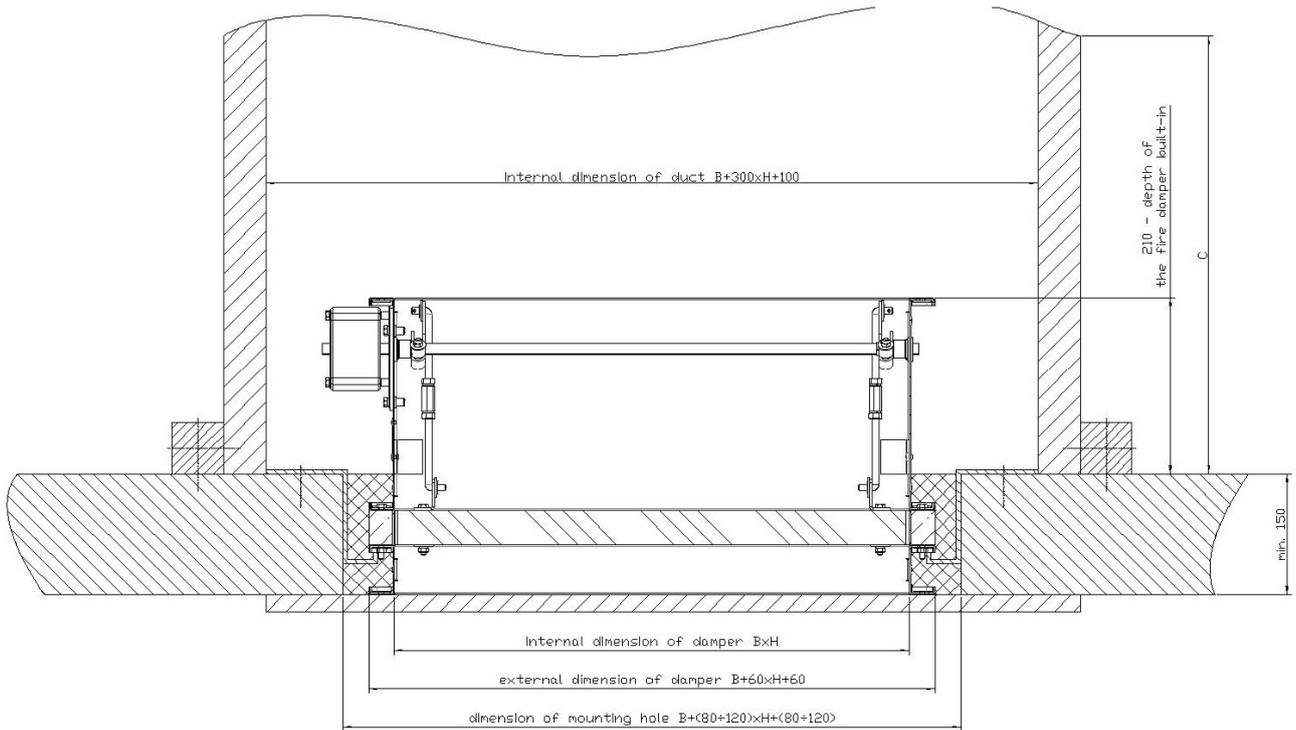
Installation method of fire dampers KWP-P in ceiling with a duct made of PROMAT boards with sealing of mineral wool
